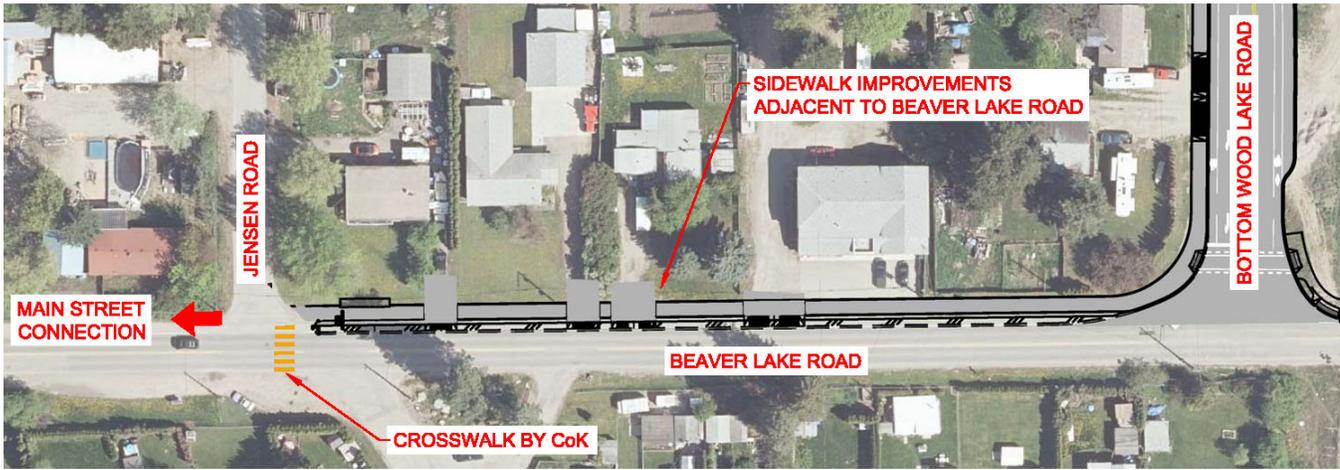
Plan showing proposed pedestrian improvements adjacent to Beaver Lake Road
